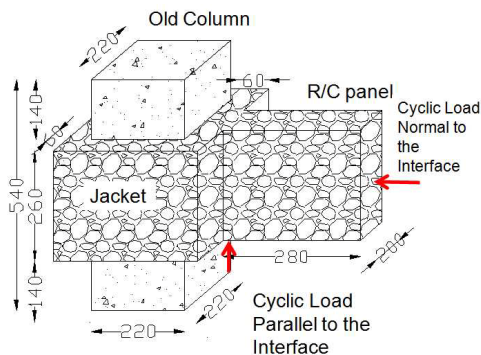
Specimen of a portion of encased R/C panel and the jacketed column.
